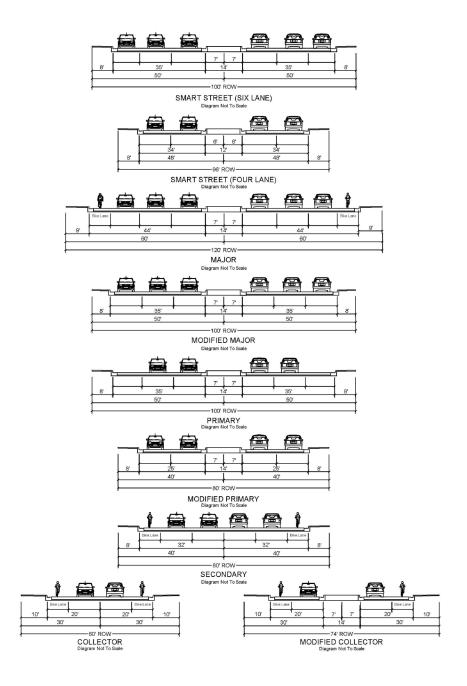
CITY OF YORBA LINDA GENERAL PLAN ROADWAY CROSS-SECTIONS
